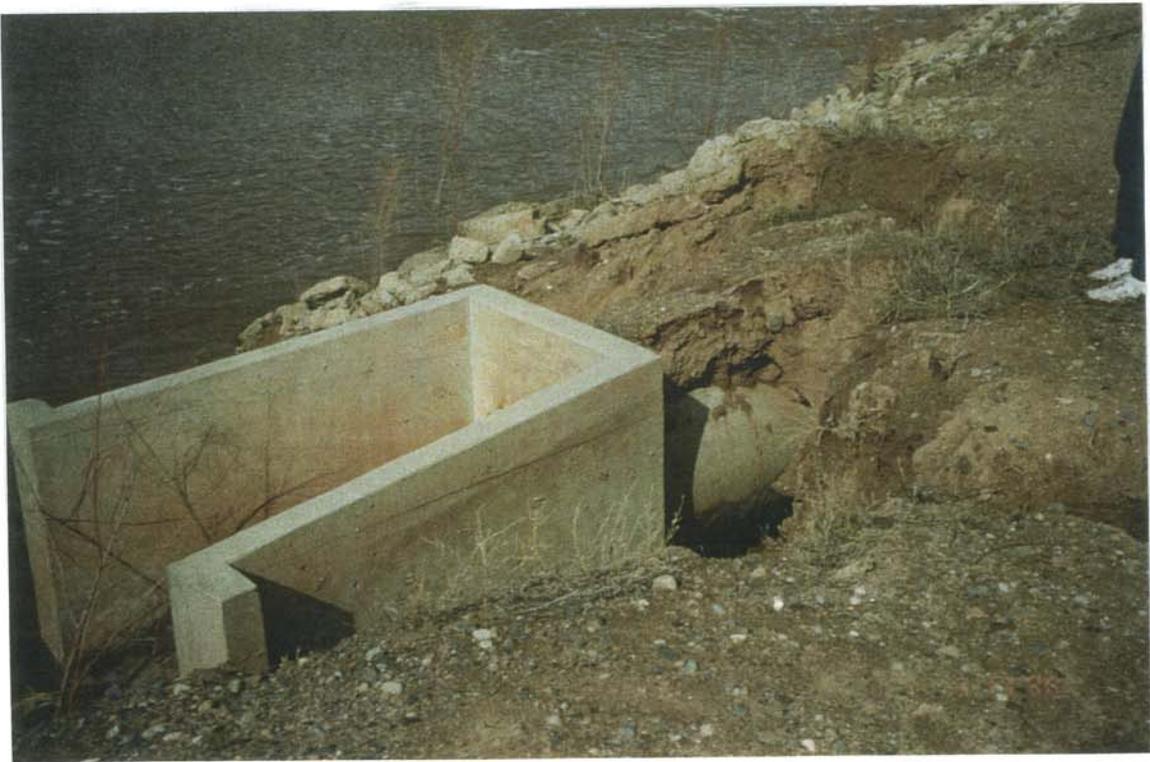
Headwall of irrigation wasteway, showing piping failure.
